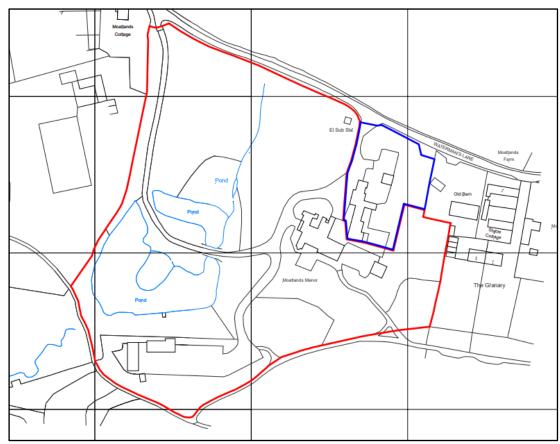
EXISTING SITE PLAN EDGED IN RED ((KENT BUILDING CONTROL)
